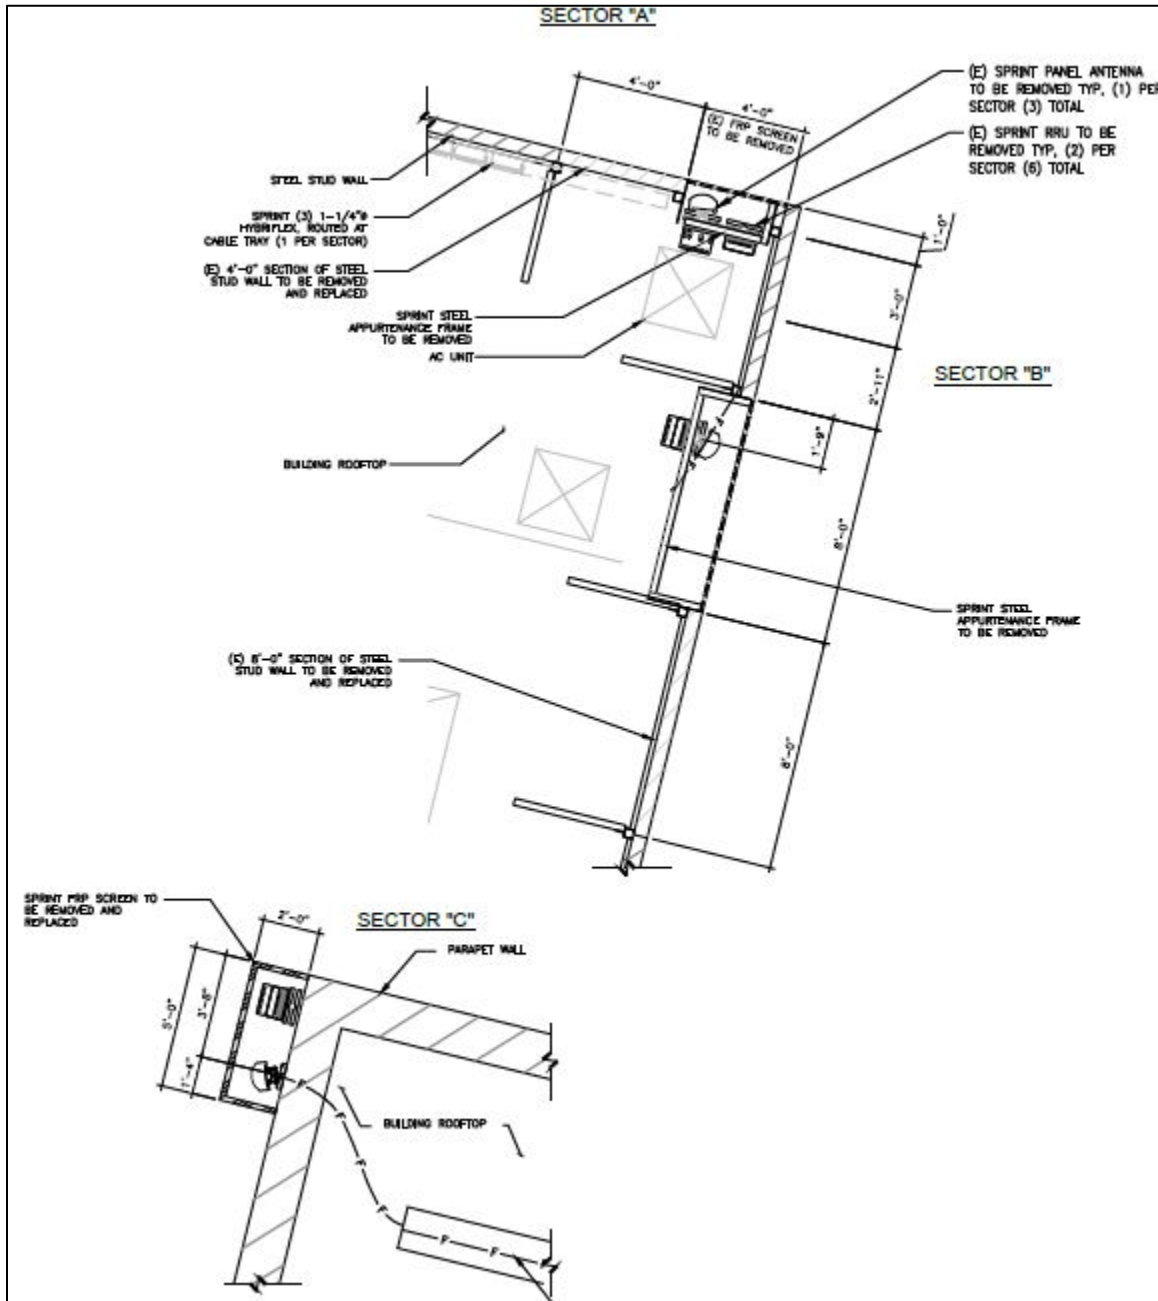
Existing antenna layout plan (Source: Plans, page A-4, panel 1).
